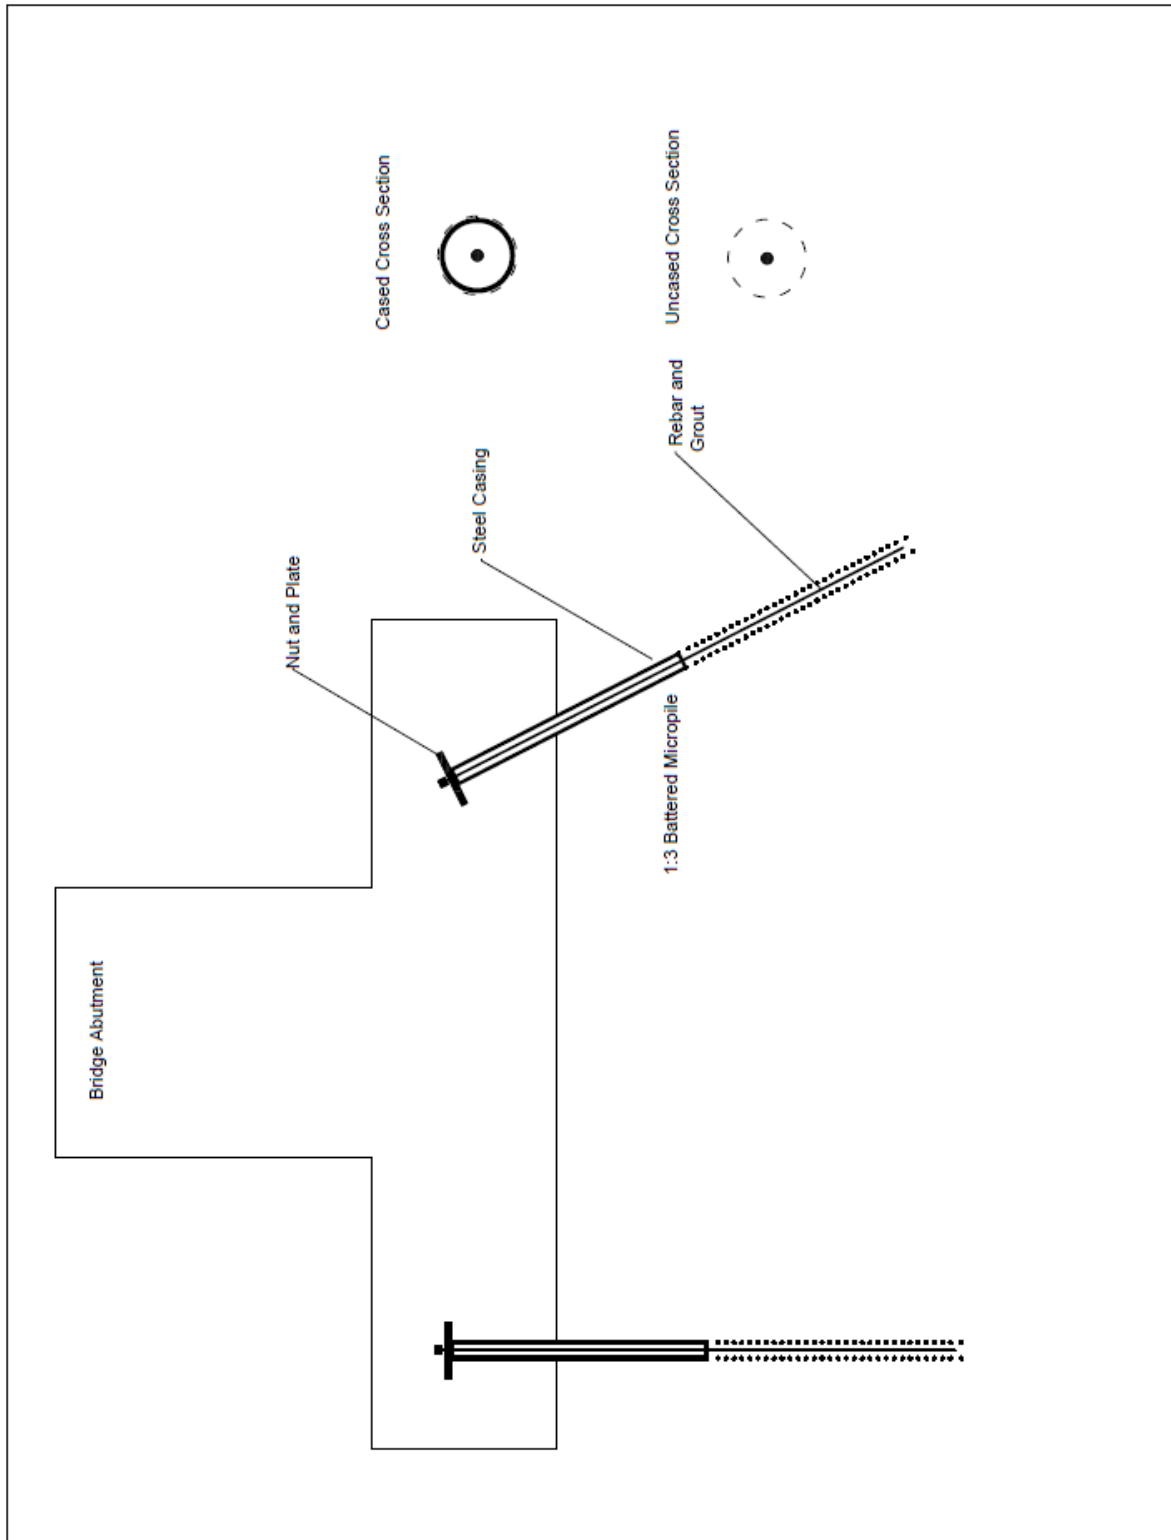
Bridge abutment micropile cross section ("Grove Road Bridge Replacement," 2014)
